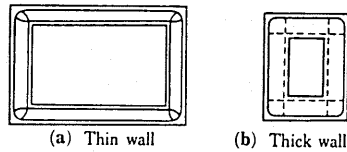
Arrangement of transverse reinforcement for a box section
